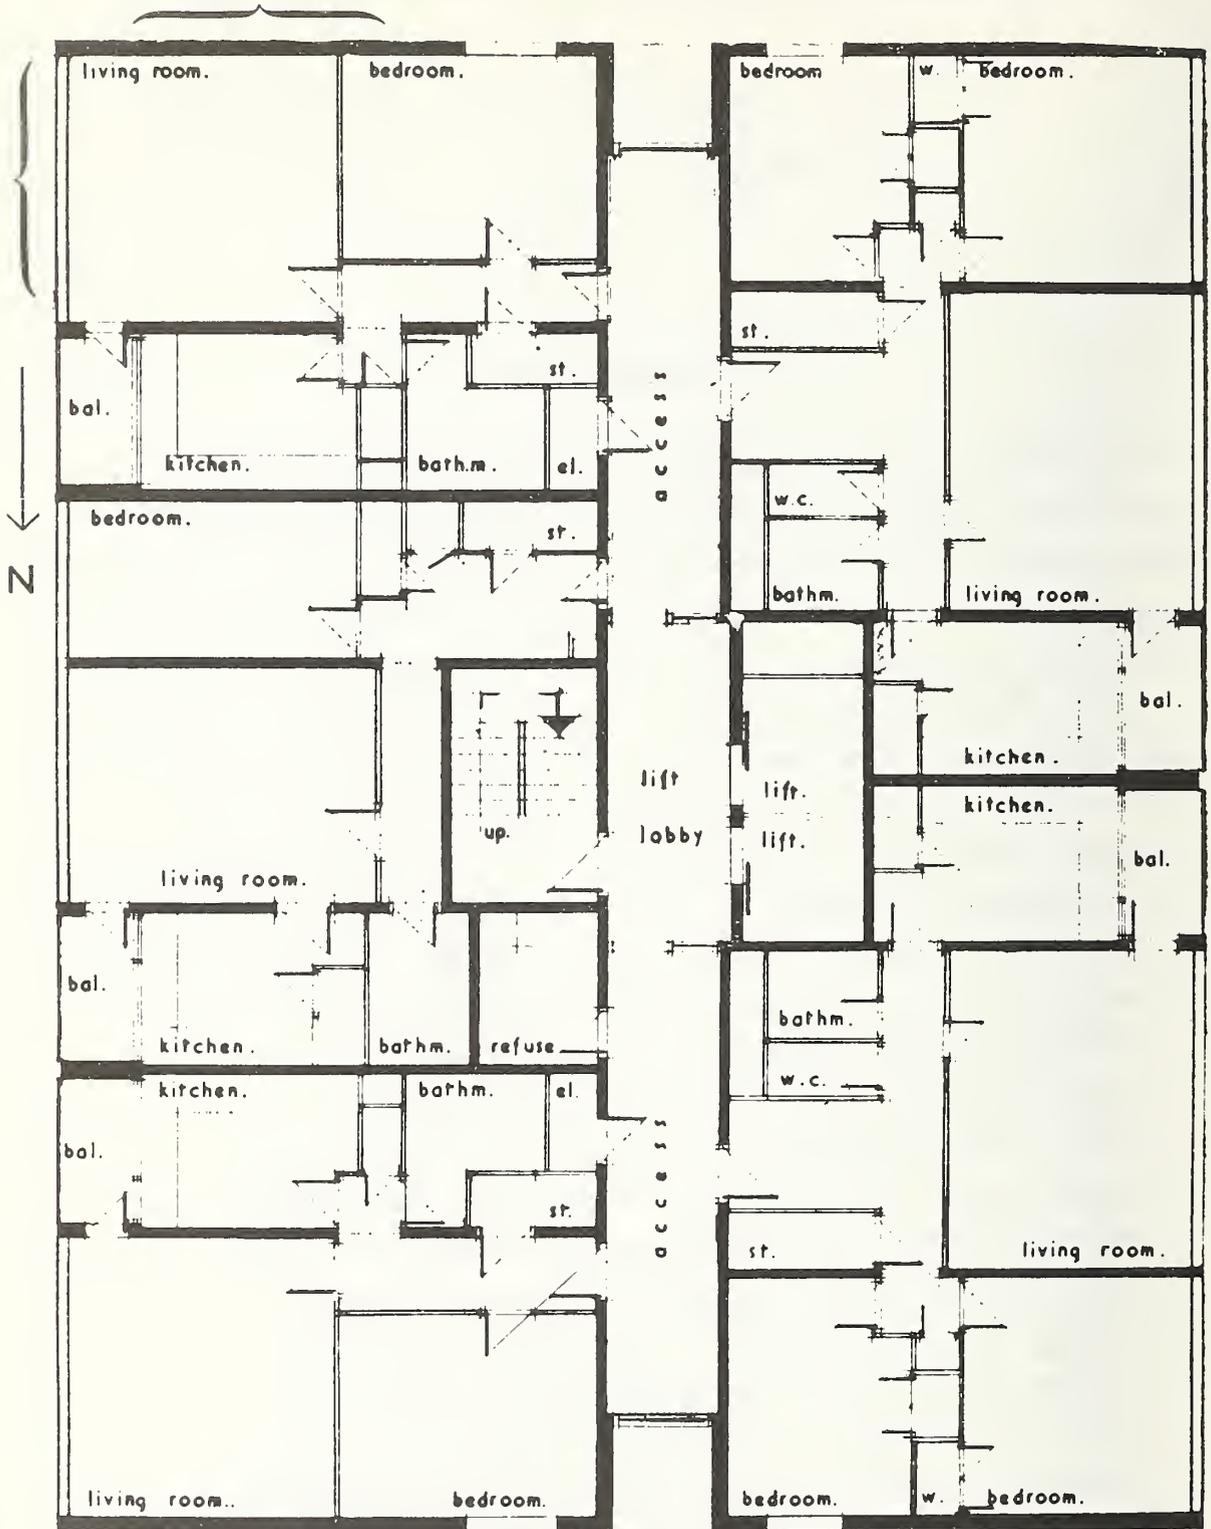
Typical floor layout of Ronan Point apartment building (explosion occurred in a SE-corner apartment). Reproduced from [1].
